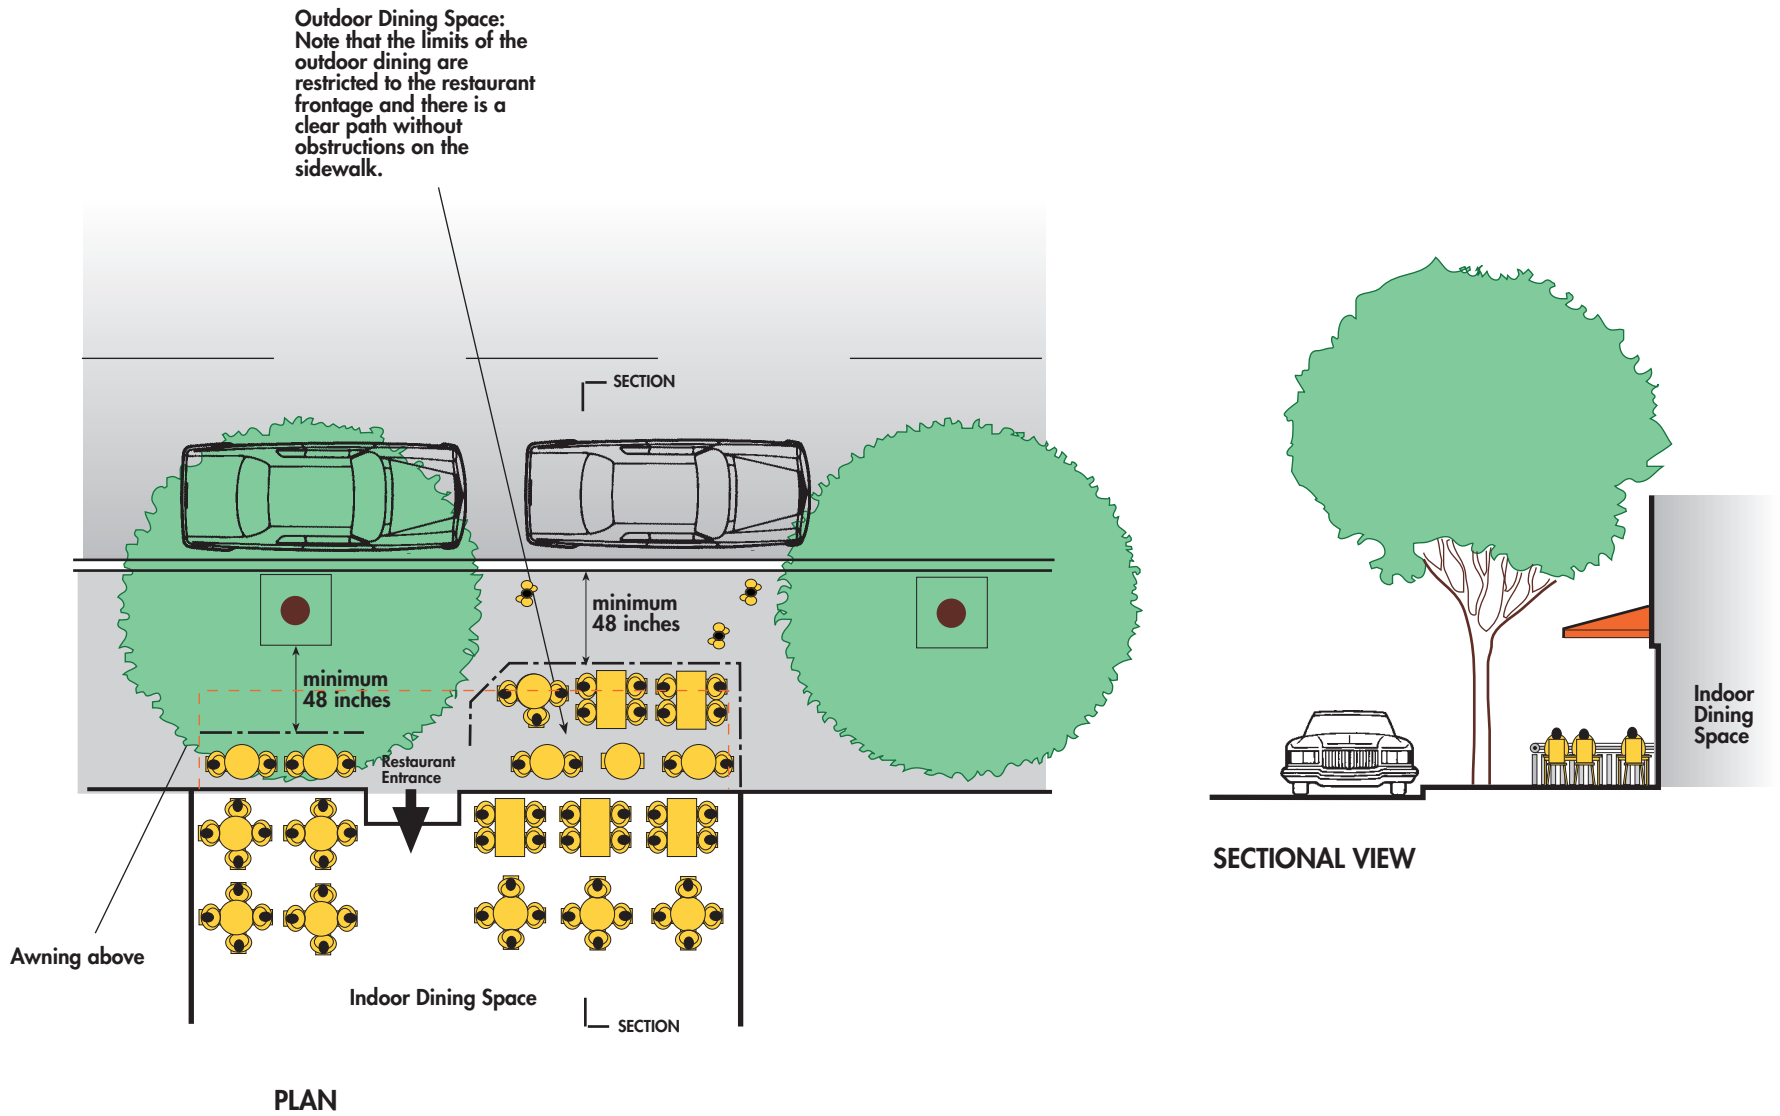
A.24: Typical Layout of Outdoor Sidewalk Dining Space
